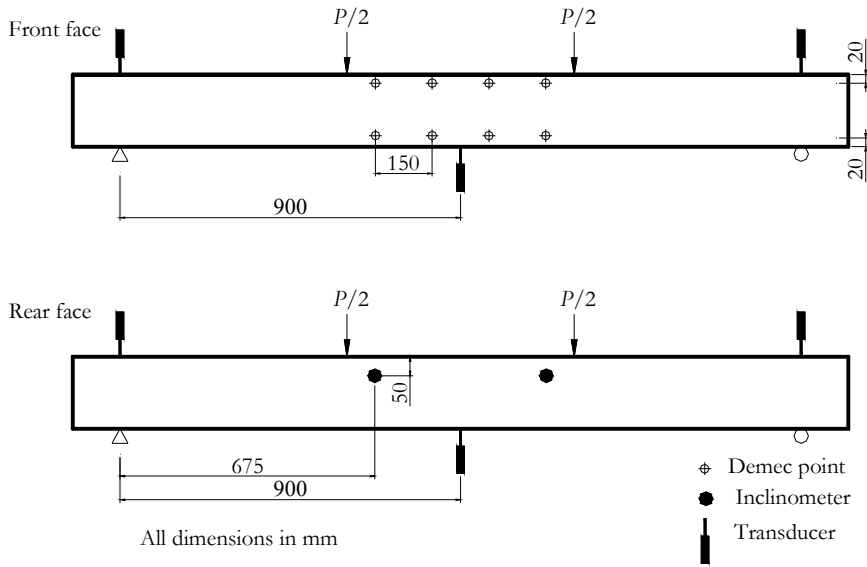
Instrumentation details for beam C2-216-D2-A.
